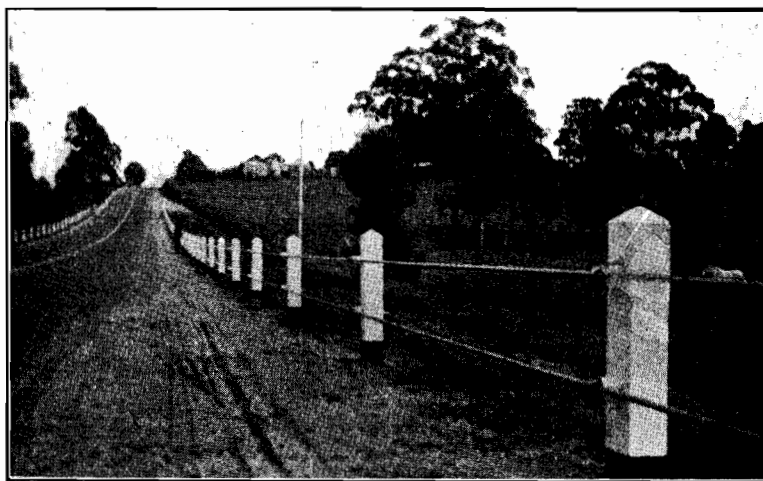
Standard Type of Guard Fencing, Princes Highway East.
